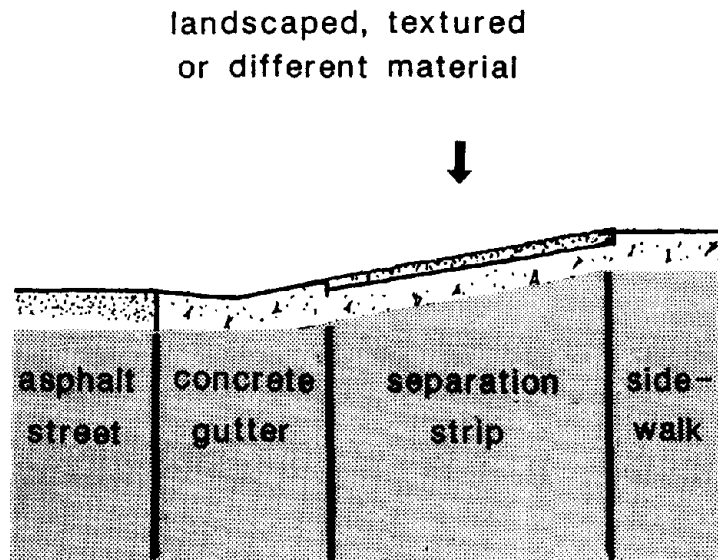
Textured strip between concrete gutter and concrete sidewalk.
